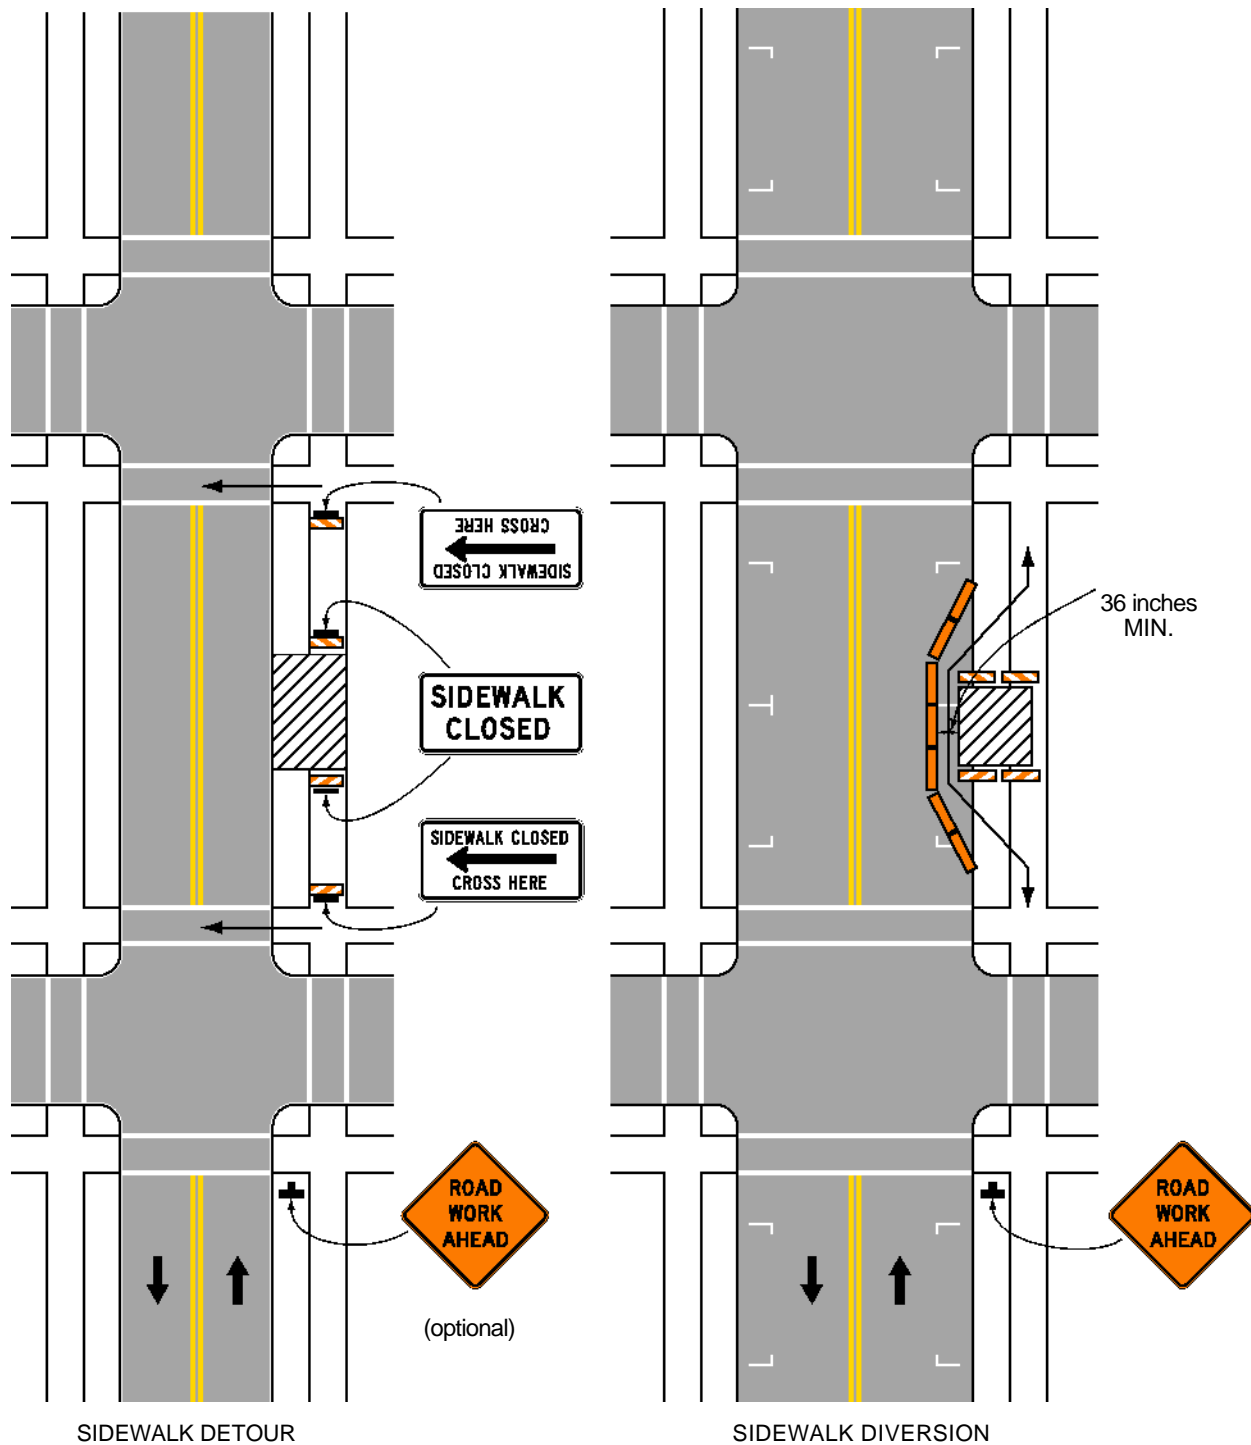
H-28. Sidewalk Detour or Diversion (TA-28)Typical Application 28
